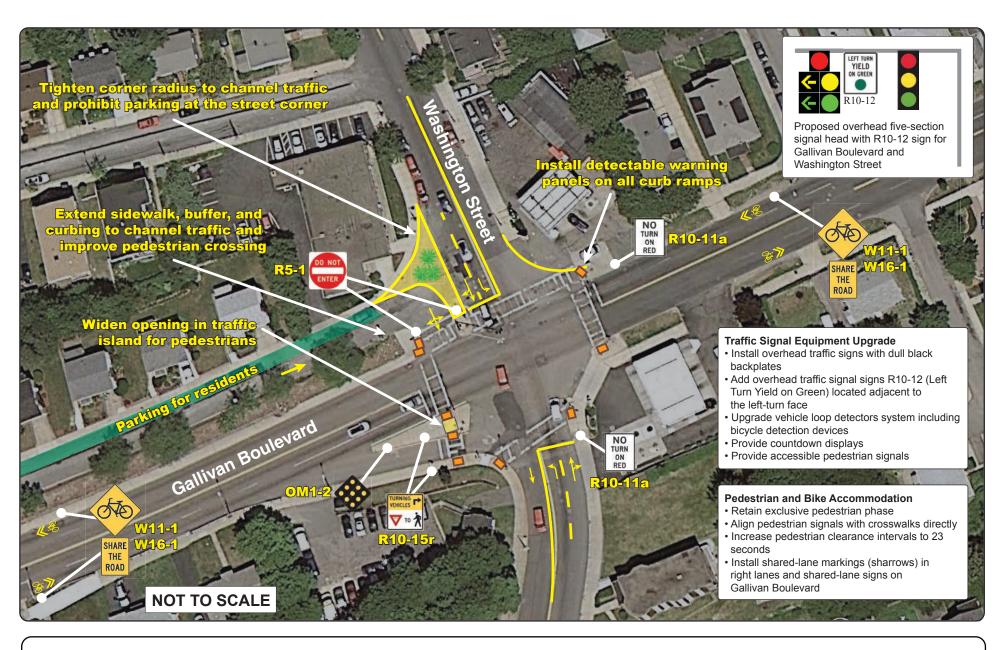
Proposed Improvements at Gallivan Boulevard and Washington Street Intersection: Option 2
